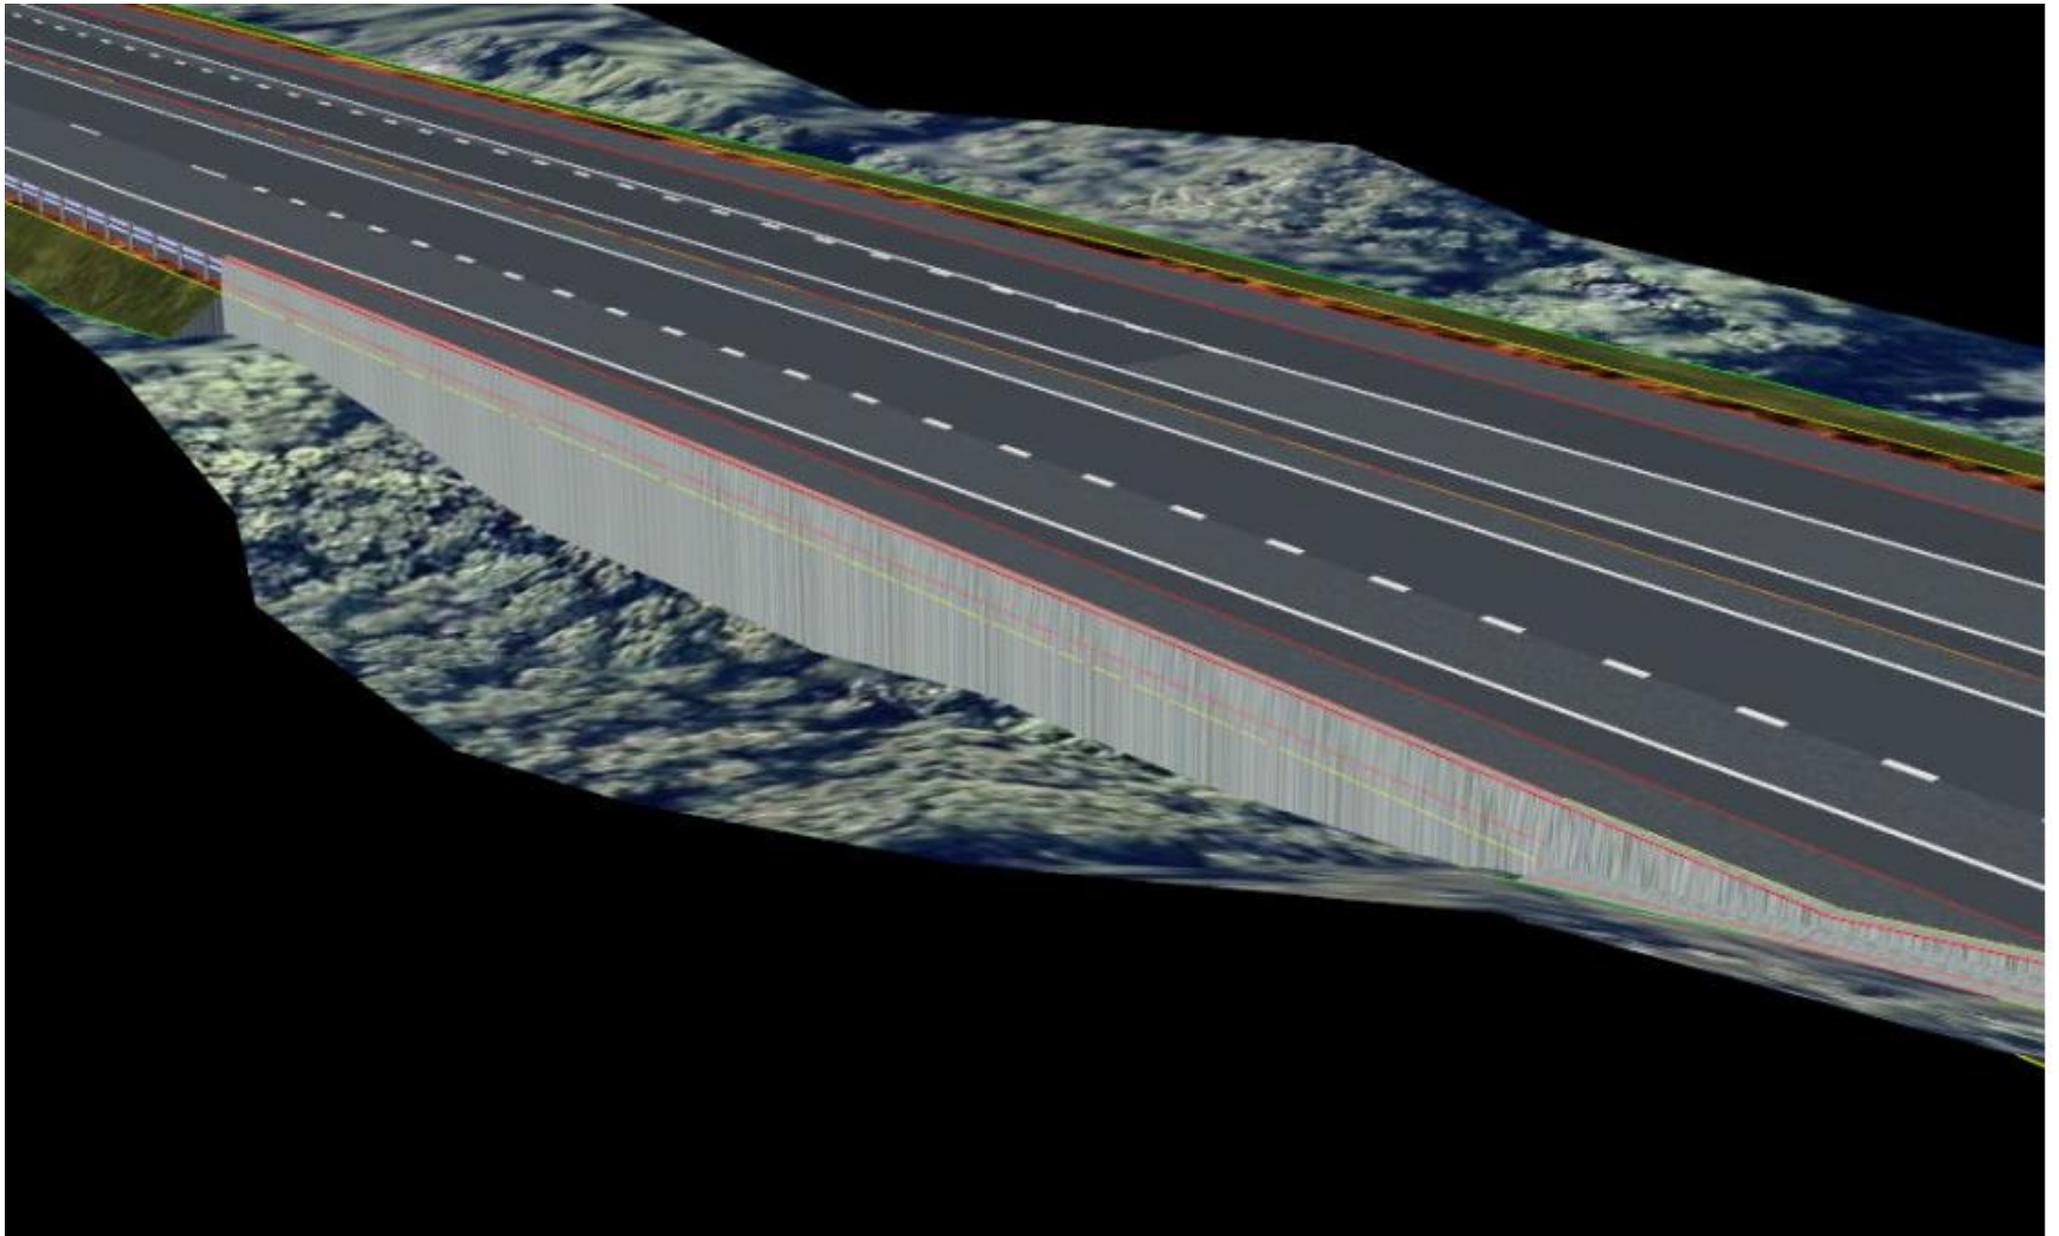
Retaining wall – MW01 Type 2 (fill)
